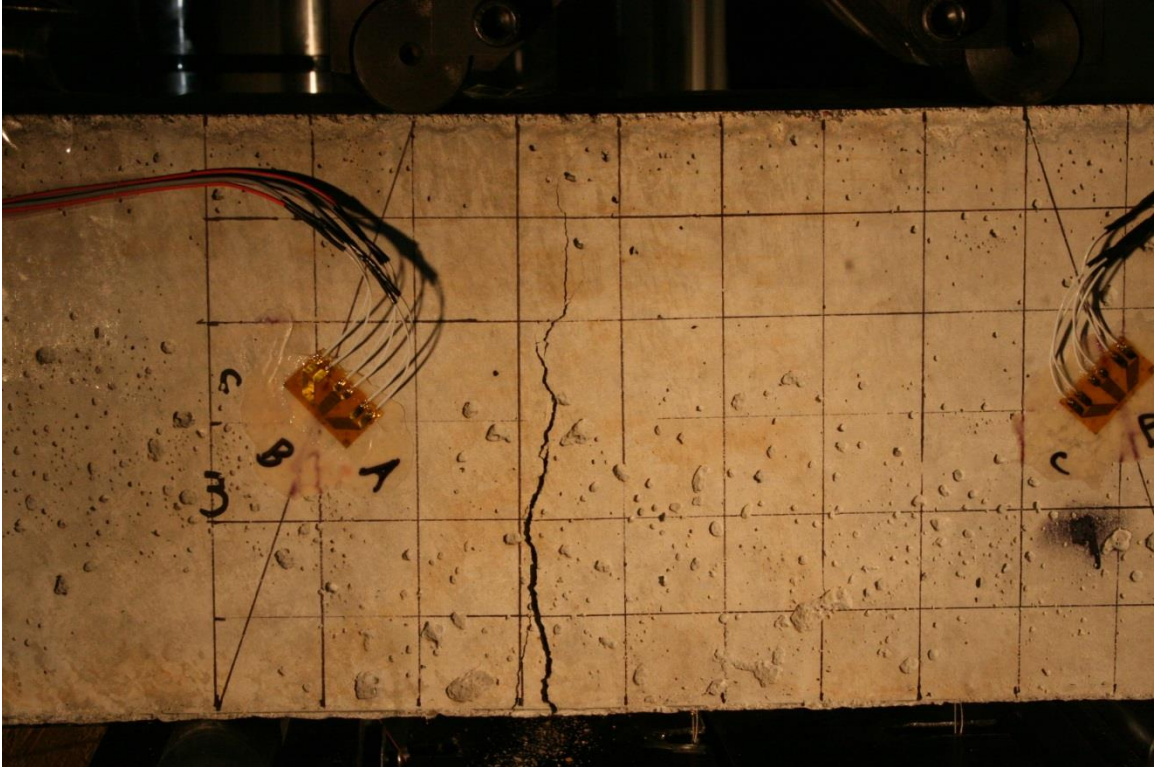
Additional Post-Test Damage, Test No. CFS-5 [10-in. (254-mm) Span]
